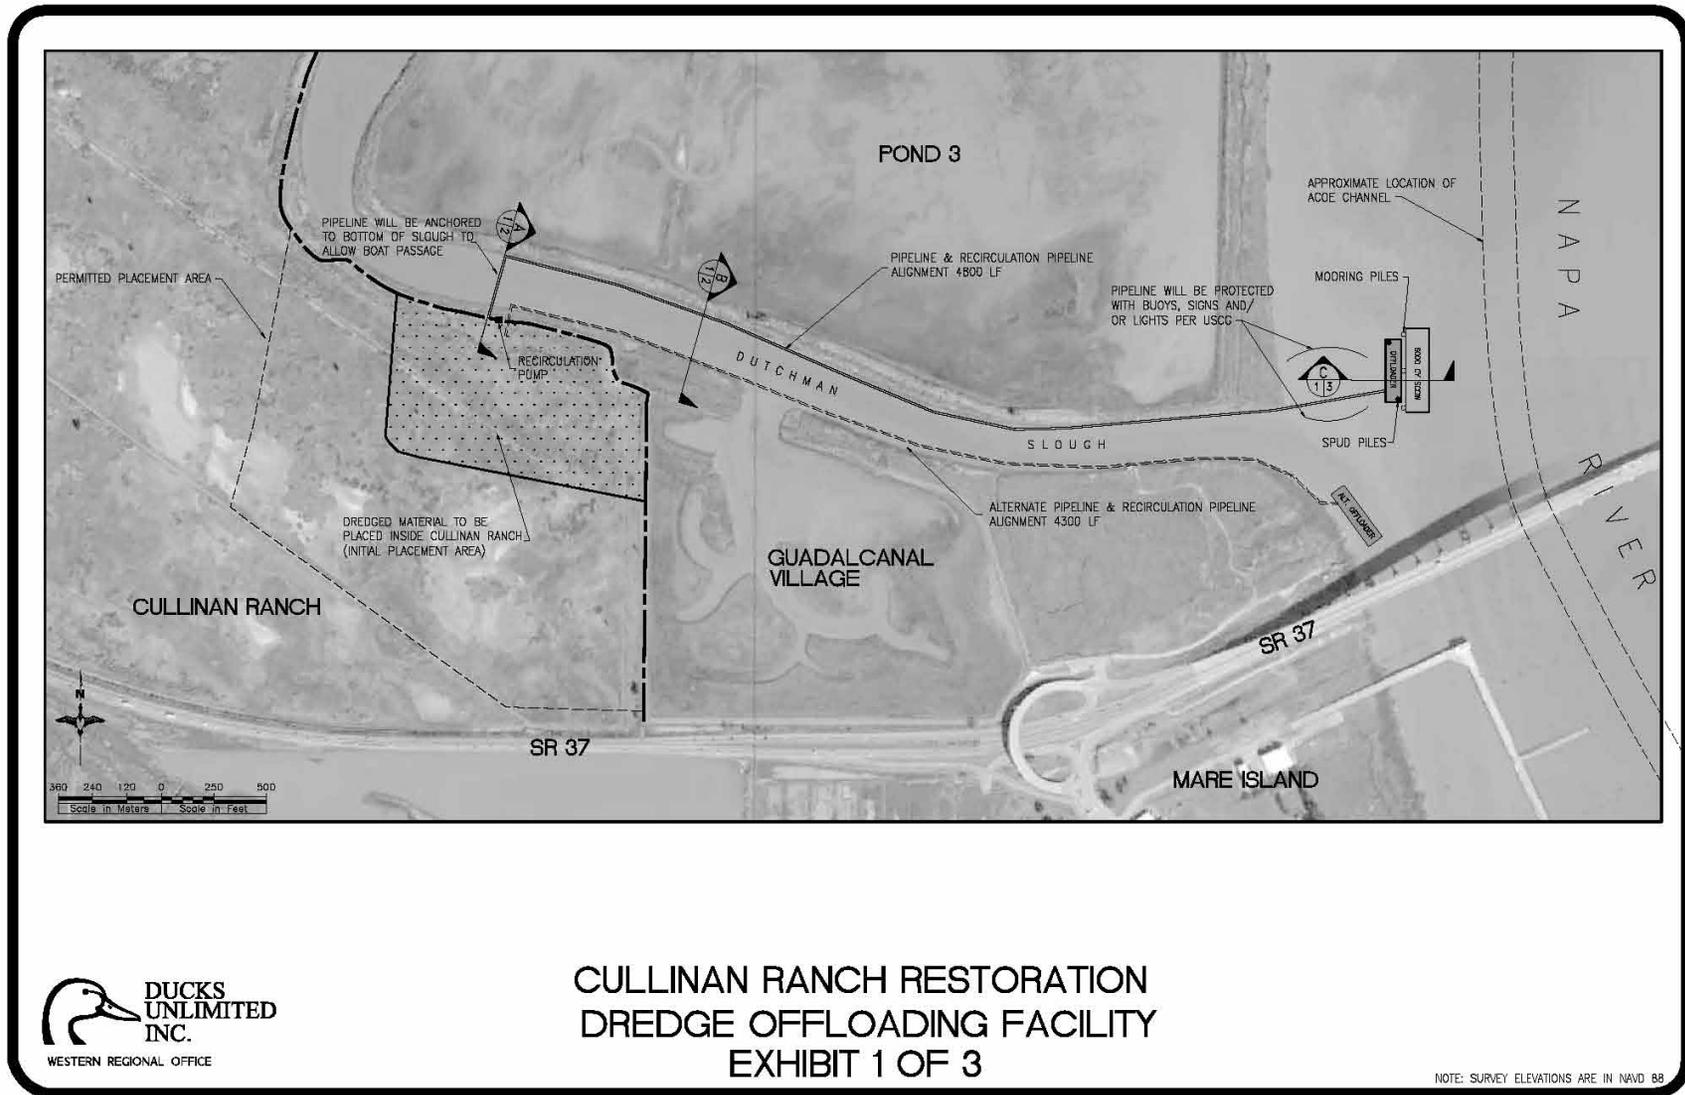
Cullinan Ranch and Modified OLF, Site Plan
